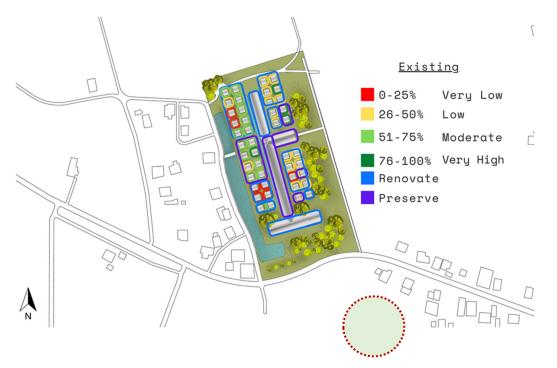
The existing of Tobacco Buildings to be renovated or preserved
